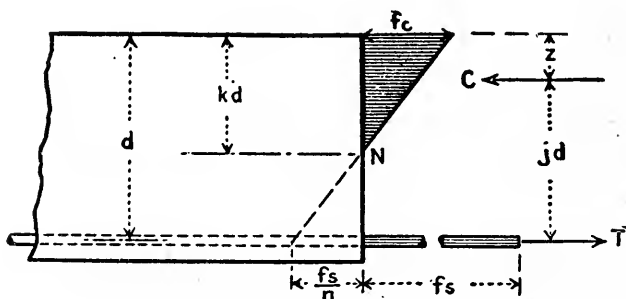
Nomenclature for Concrete Beam Reinforced for Tension
